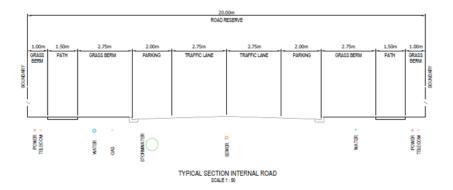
Typical Cross Section for Howard Street Development Internal Road
